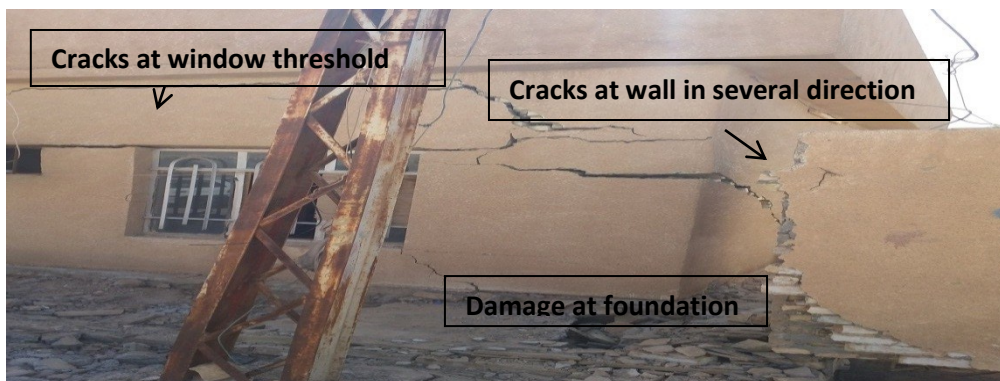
(A) Cracks at walls and window threshold due to Damage found
